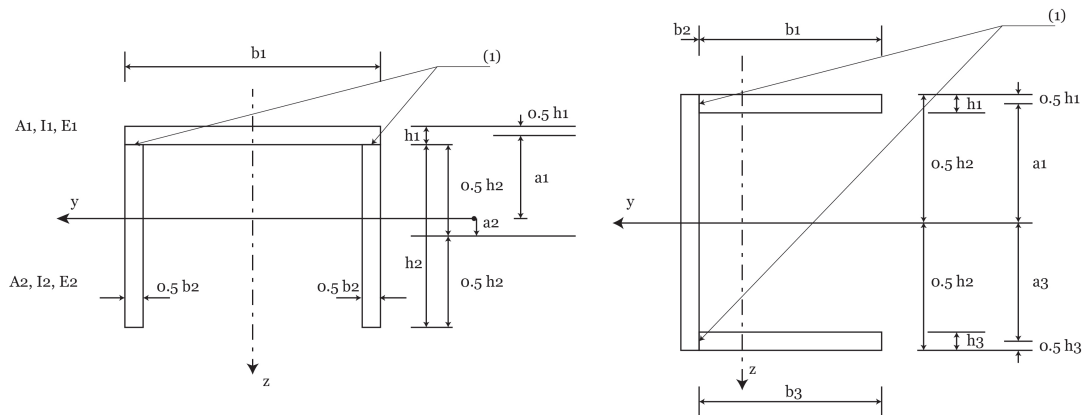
Dimensions and symbols of mechanically jointed beams theory
